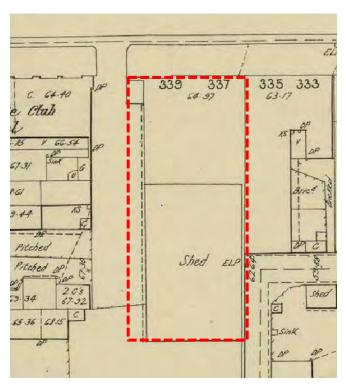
Detail of MMBW plan no. 1016, 1894 showing the structures on the site prior to the construction of the subject building, Dickinson's warehouse
